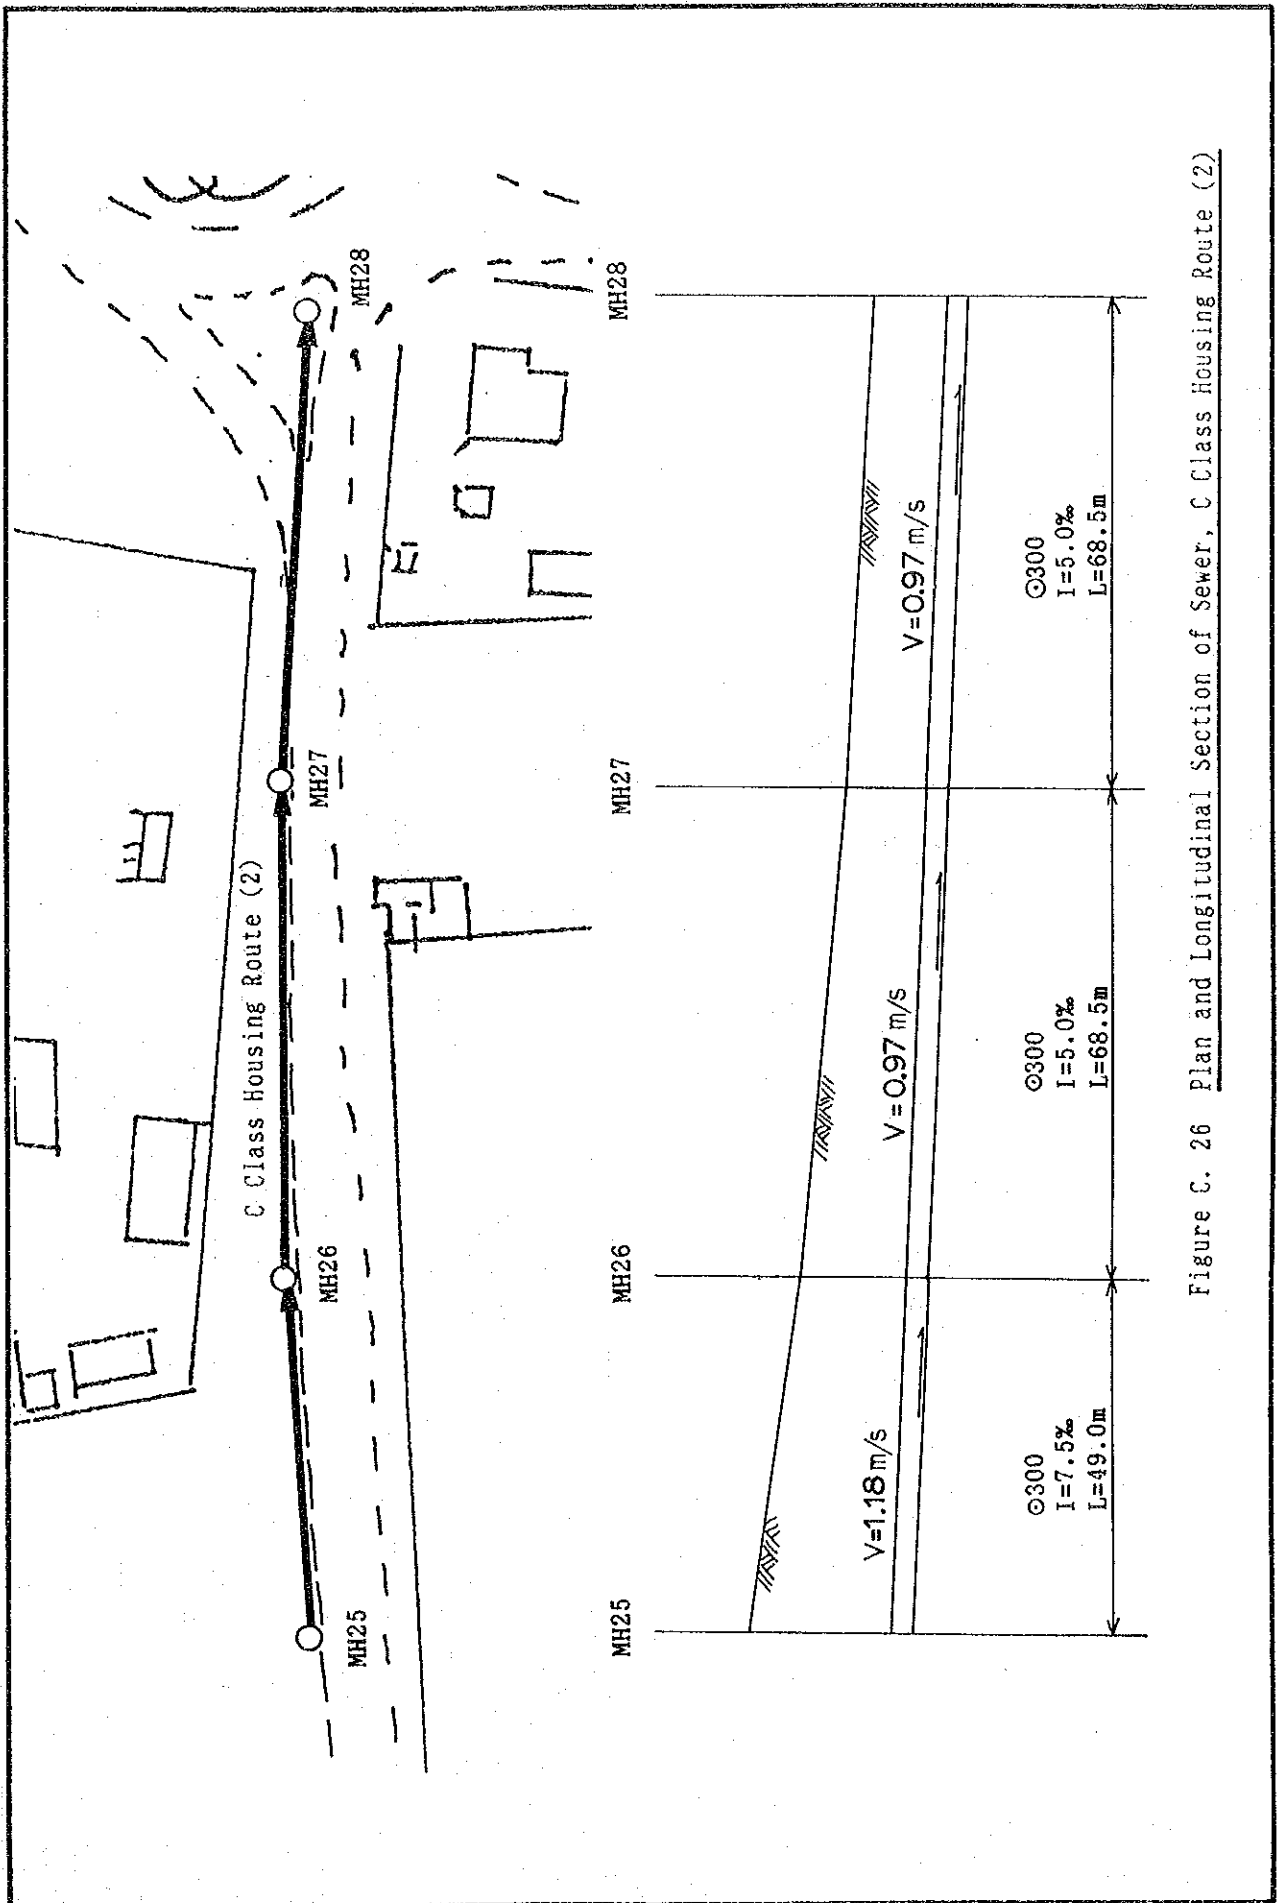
Plan and Longitudinal Section of Sewer, C Class Housing Route (2)
